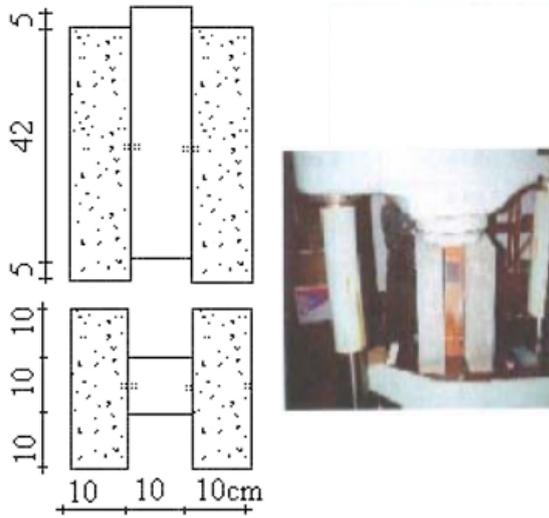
Specimen details at the second series of tests [18] (units in cm)
